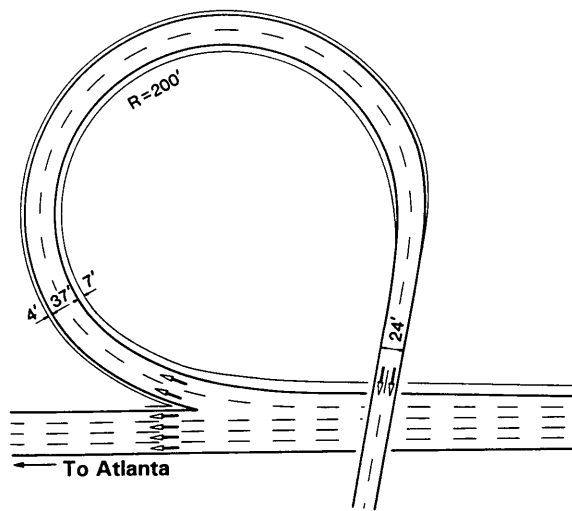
Two-lane loop ramp I-75 to I-285W.
